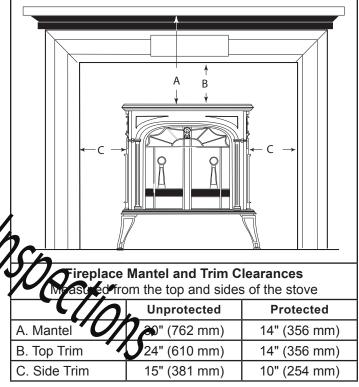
Maintain clearances to combustible components of the mantelpiece.
